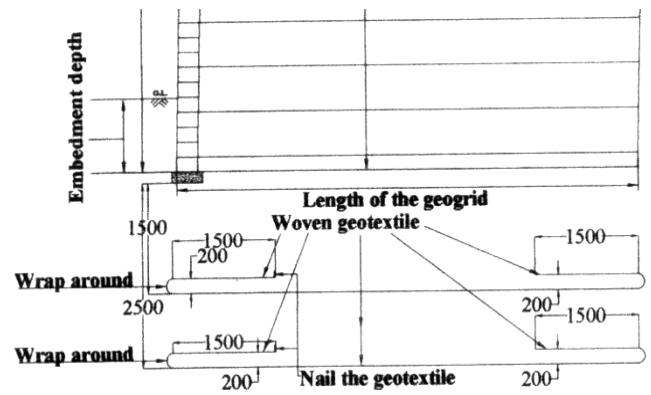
(b). Typical RE wall NH-8 Kamrej Soil Adopting Soil Improvement Depth 2.5 m, Geofabrics as Reinforcement, (Umravia, N. B. et al, 2010)
